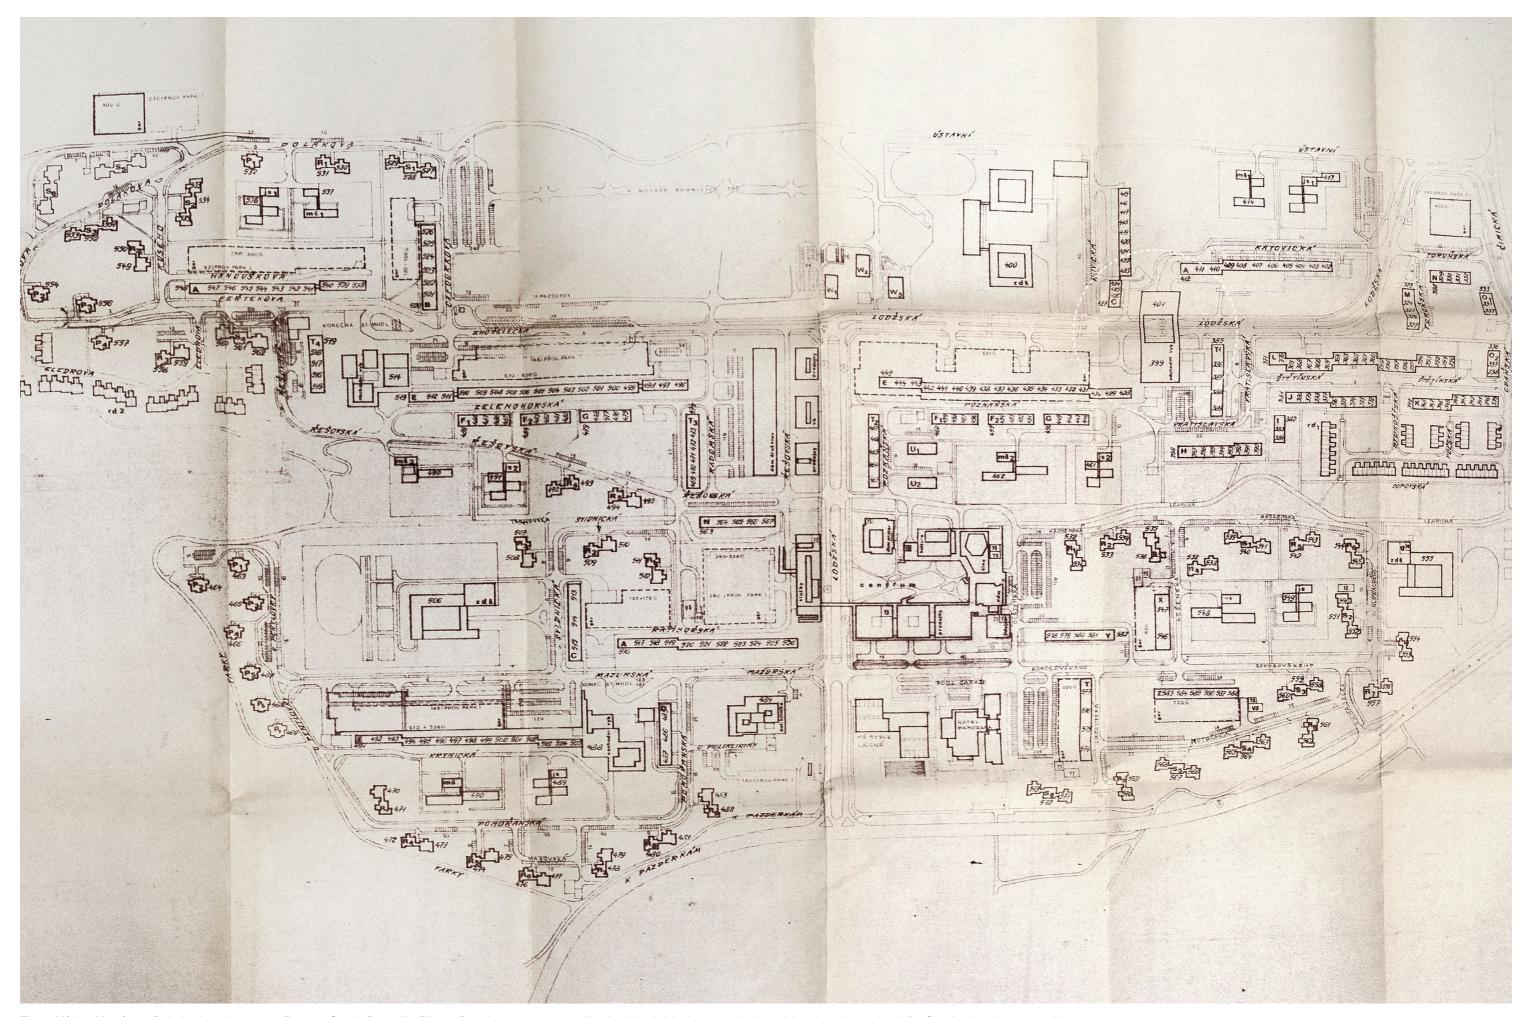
Václav Havránek, Bohnice housing estate, Prague, Czech Republic, Plan of Bohnice from 1970. In this plan it is visible that organization of the plan changed rapidly. Odra's size changed and its interconnection with buildings in close surroundings changed but still remained few connections and concept of bridge. © Building Authority of Prague 8 - Archives, Odra Plány - Společné 399-401
